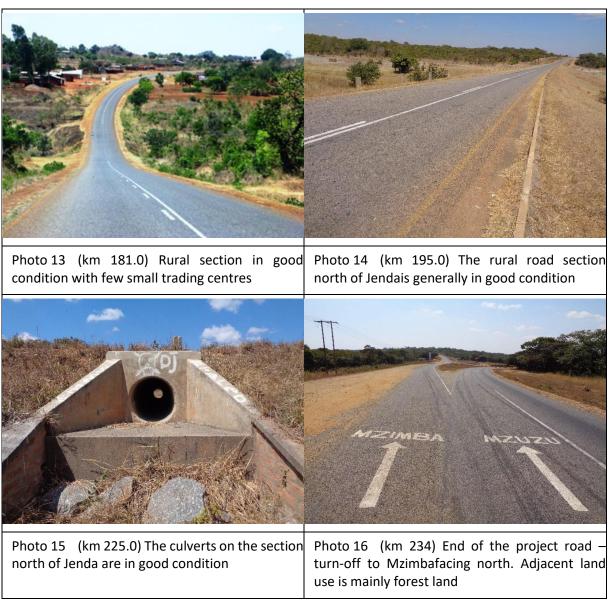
Current Road Conditions and Land Uses (Source: Roughton Preliminary Design Report, 2016)
